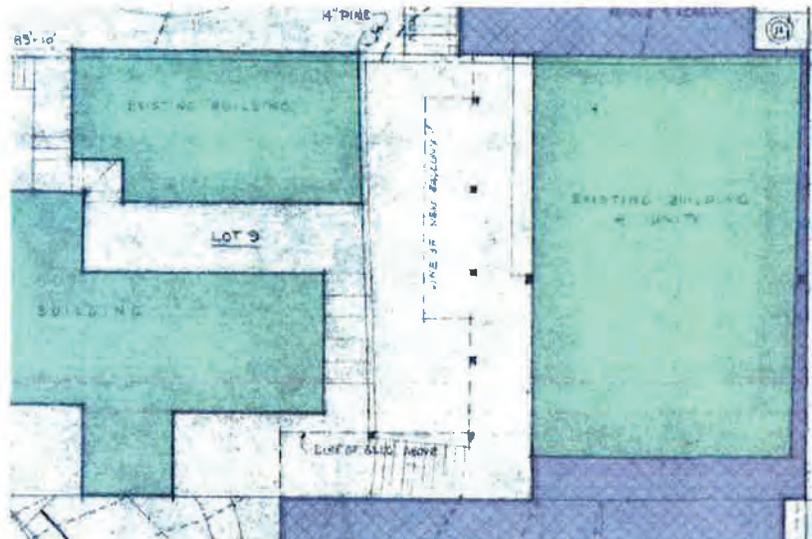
1957 drawing showing pre-existing buildings in green and addition wrapping around in blue. See Attachment A for full drawing sheet.
